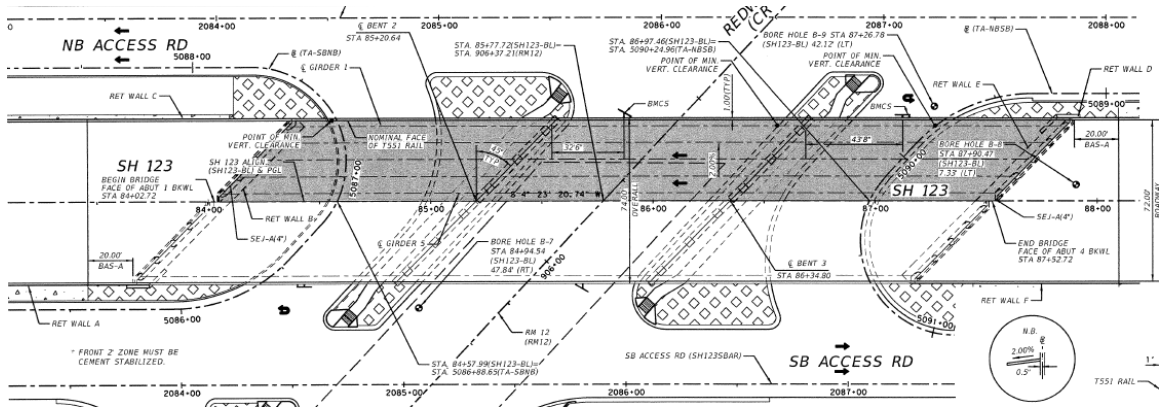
SH123 Plan View Drawing (TxDOT)
